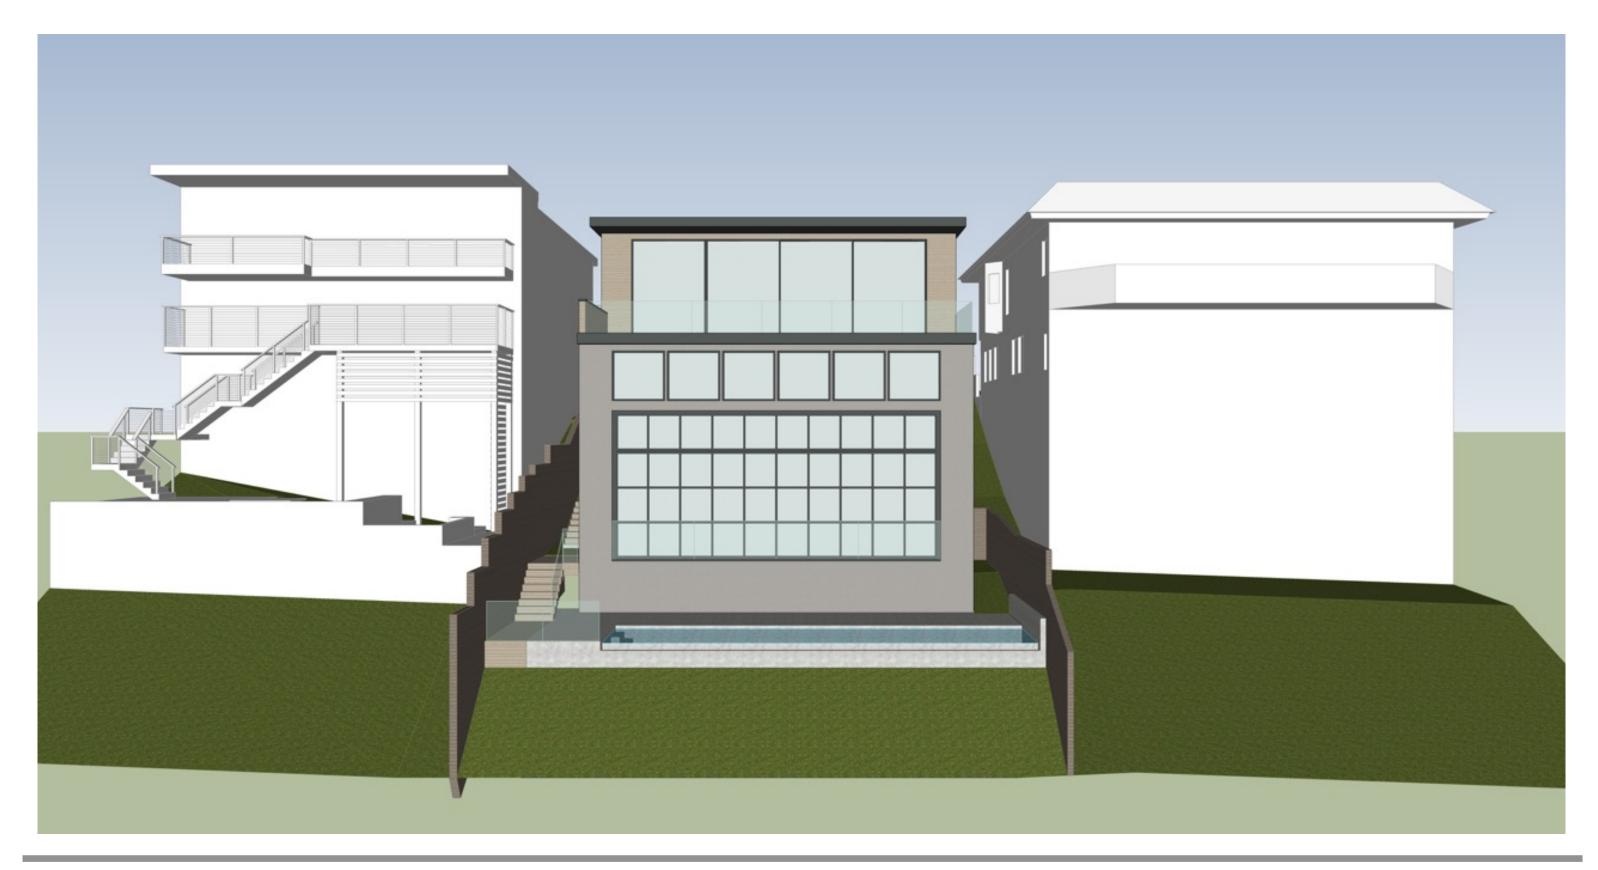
### EXHIBIT A PROPOSED SECTION WITH 3RD FLOOR ROOF DECK LOWERED 2'-6"
